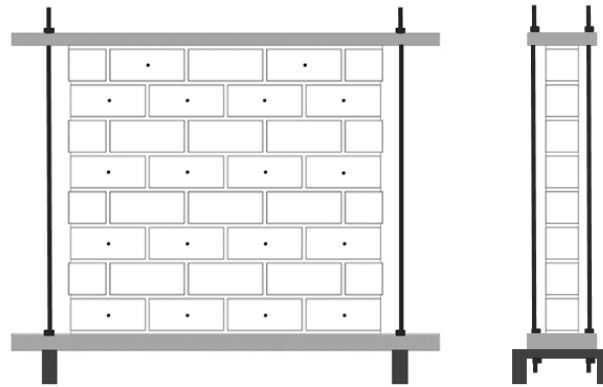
Wallets geometry and symmetrically drilled holes for the anchor.
